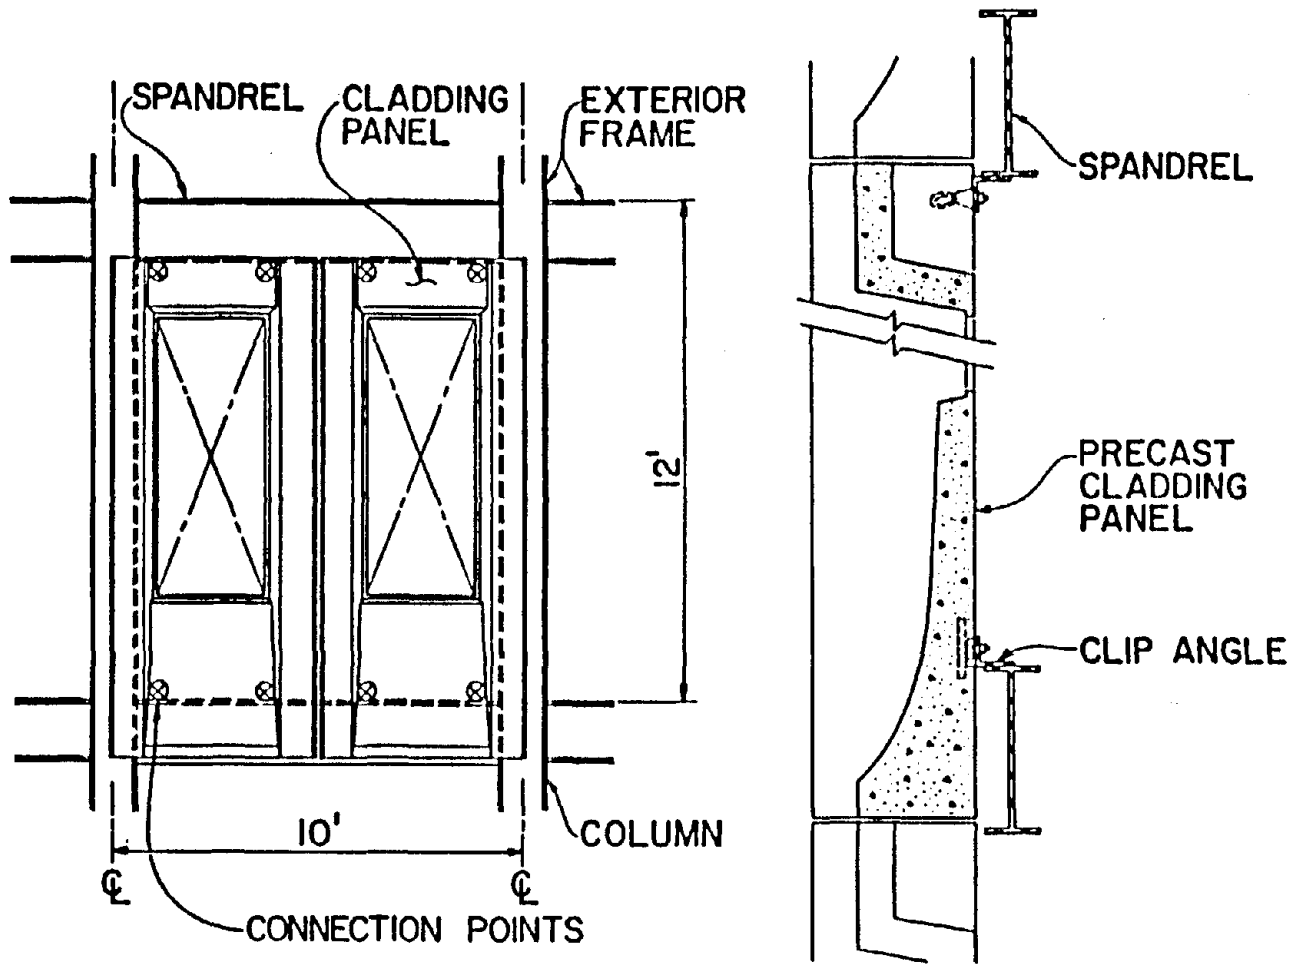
Typical Exterior Bay of Curtain Wall and Connection Details.
